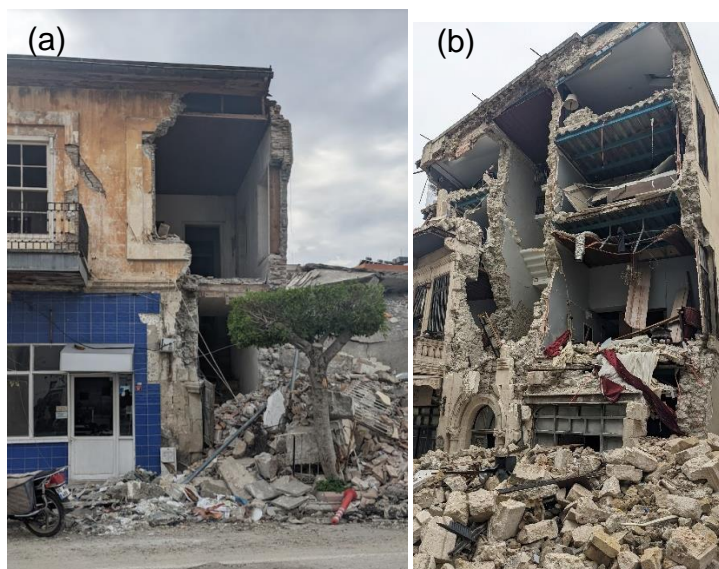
Photographs of damage in two buildings with floor structures spanning in a single direction: (a) a building in İskenderun with a timber floor and (b) the west façade of the early 20th century Liwan Hotel building in Antakya with a retrofitted steel-concrete floor.
